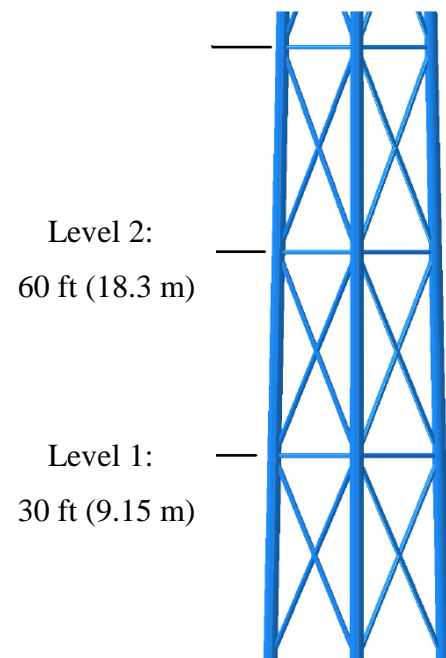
An Illustration of the Bracing Layout at the UHPC Lattice Tower Base
